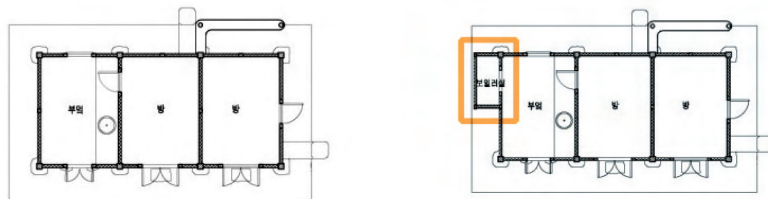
Design Guidelines for Modification of Layout and Structure (new construction of bathroom as a straw-thatched annex)
